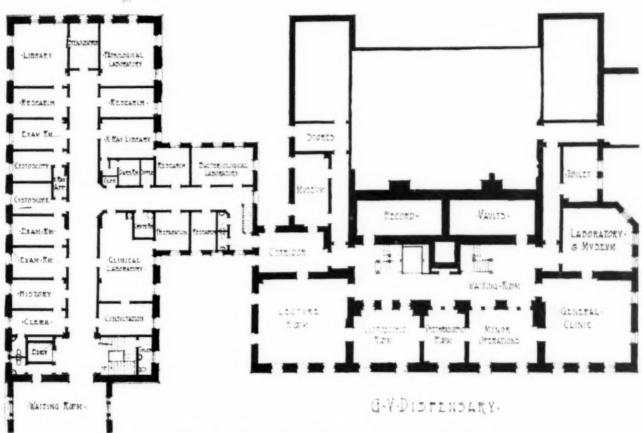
James Buchanan Brady Urological Institute-First story of new building.
